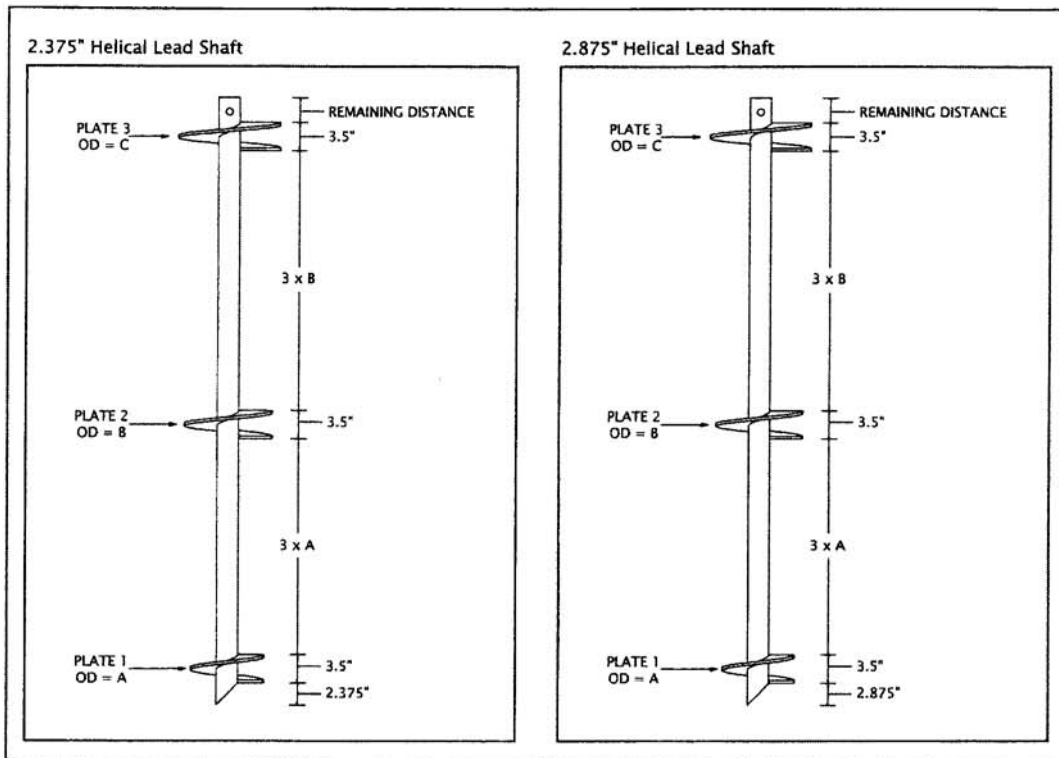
TYPICAL HELICAL ANCHORS AND THEIR PLATE SPACING CHARACTERISTICS
